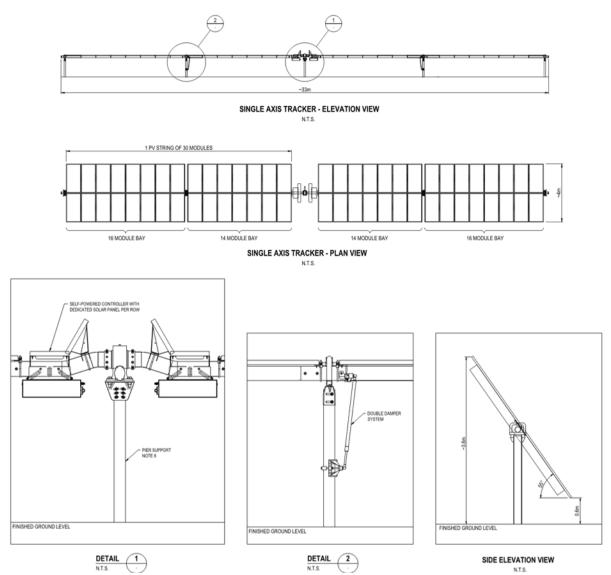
Typical Ground-mounted, Single Access Tracking (SAT) Solar Panel Layout (see Appendix B- Design Drawings for greater detail)
